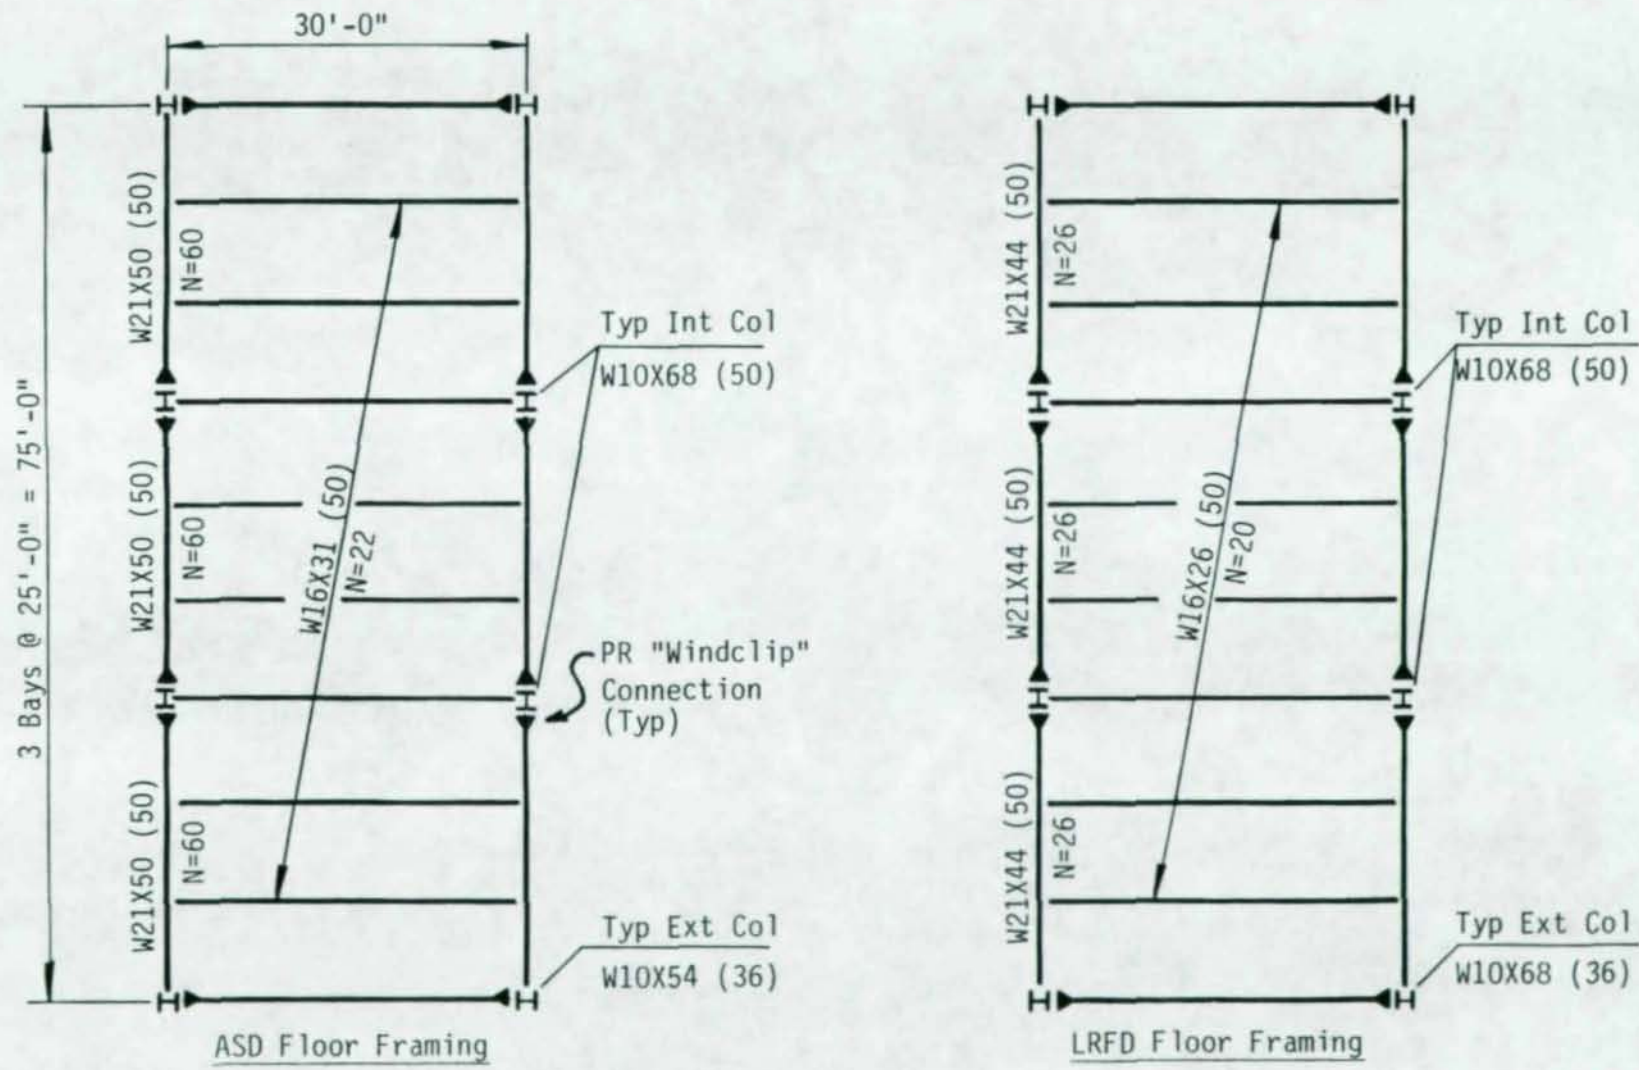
Low Rise Office Building Floor Framing Design Comparison
